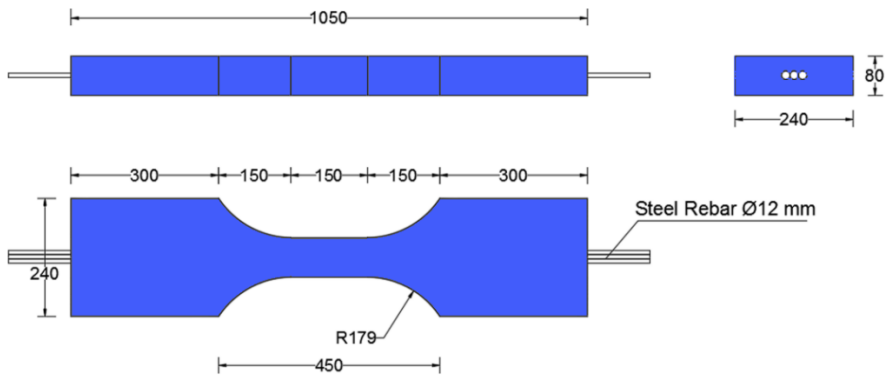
33: Dog bone-shape specimen's geometry and dimension (units: mm).
